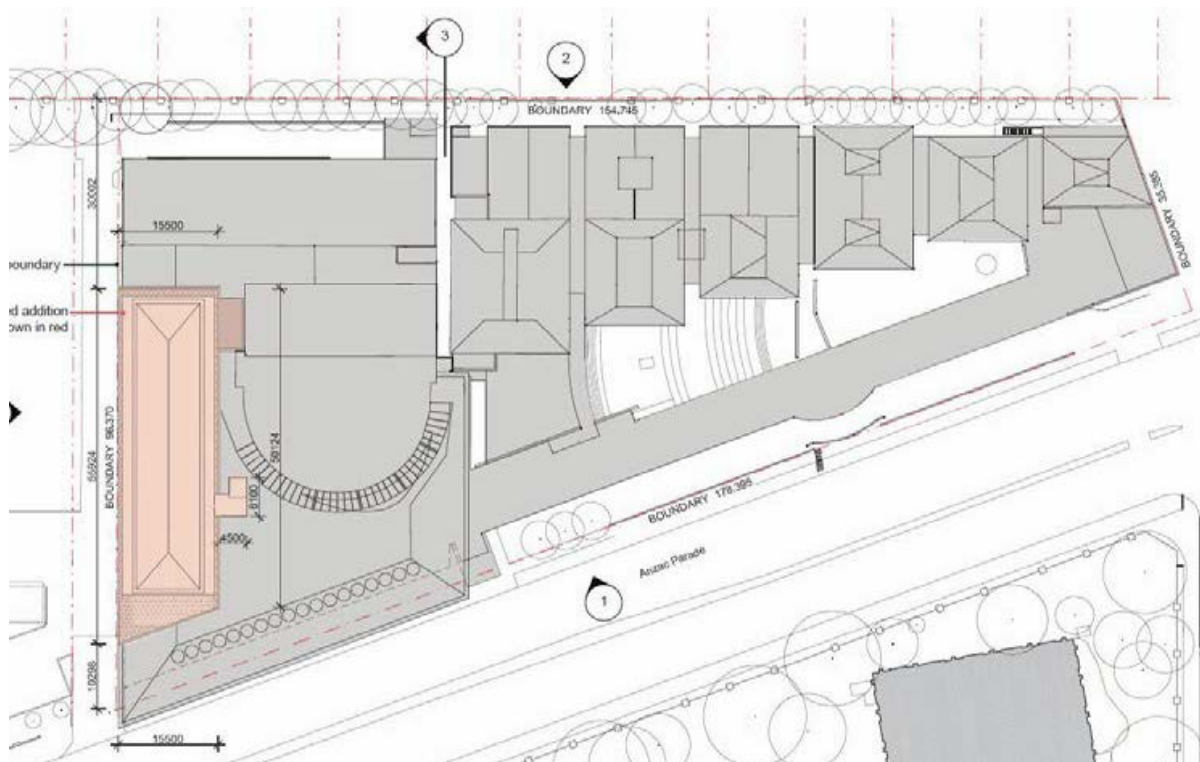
Site Plan Showing Proposed Addition (Source JBA)
